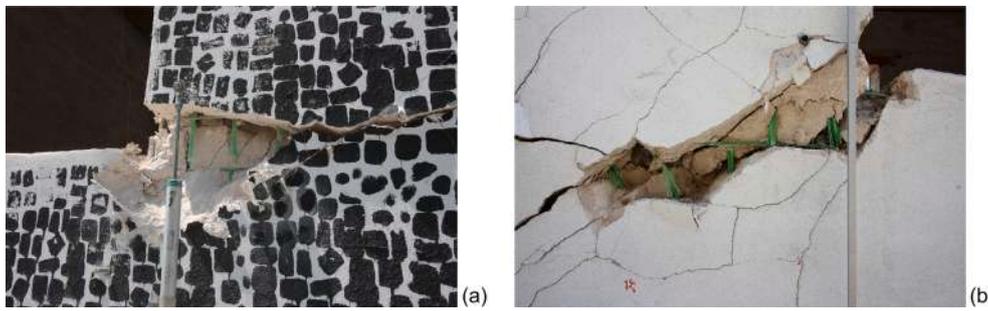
Mesh failure at the bottom left corner of the pier Ep1b (a) and at the bottom right corner of the pier Wp1a (b).
